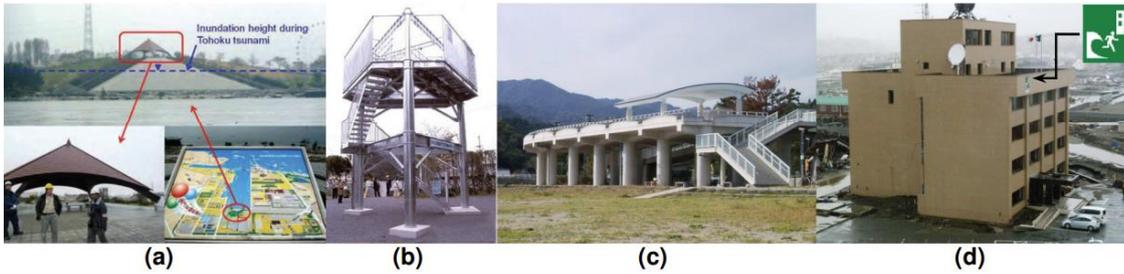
Tsunami evacuation structures (FEMA P-646, 2012): (a) soil berm at Sendai, Japan; (b) Life-Saving Tower; (c) Minamisanriku, Japan; and (d) Kesenuma Port, Japan
